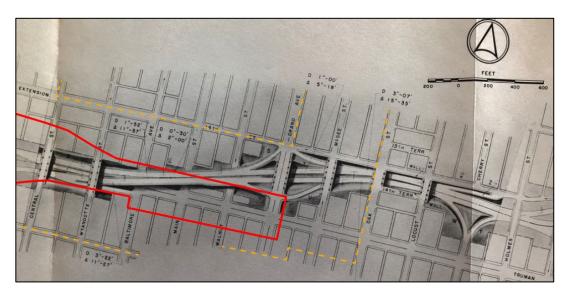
Original drawing of Section D-3 of the Crosstown Freeway (I-35), where a portion of the Project Study Area and APE are located.
